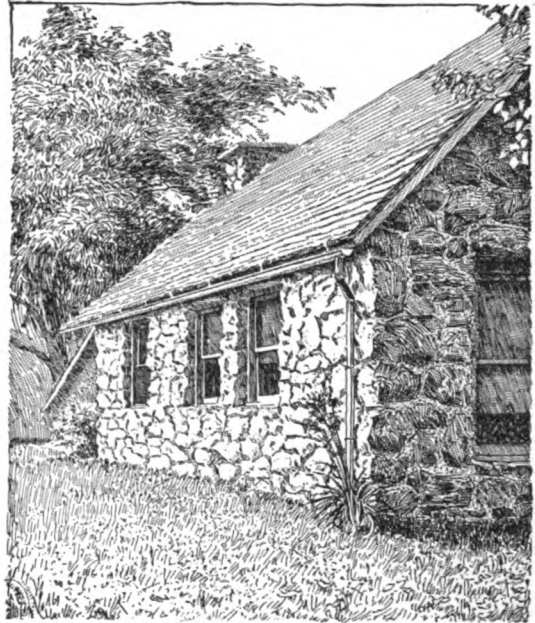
Rough and good stone work, such as should be much commoner in farm buildings. A farm cottage in central New York.
